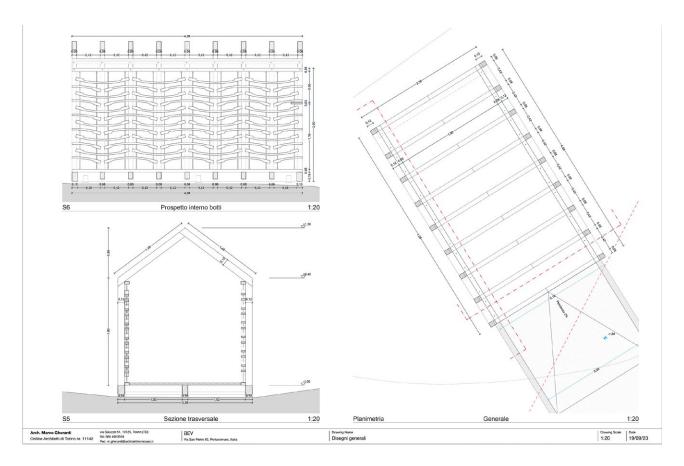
| Final design of CiaBOT: plan, elevation, and section (M. Gherardi, C. Goia).
